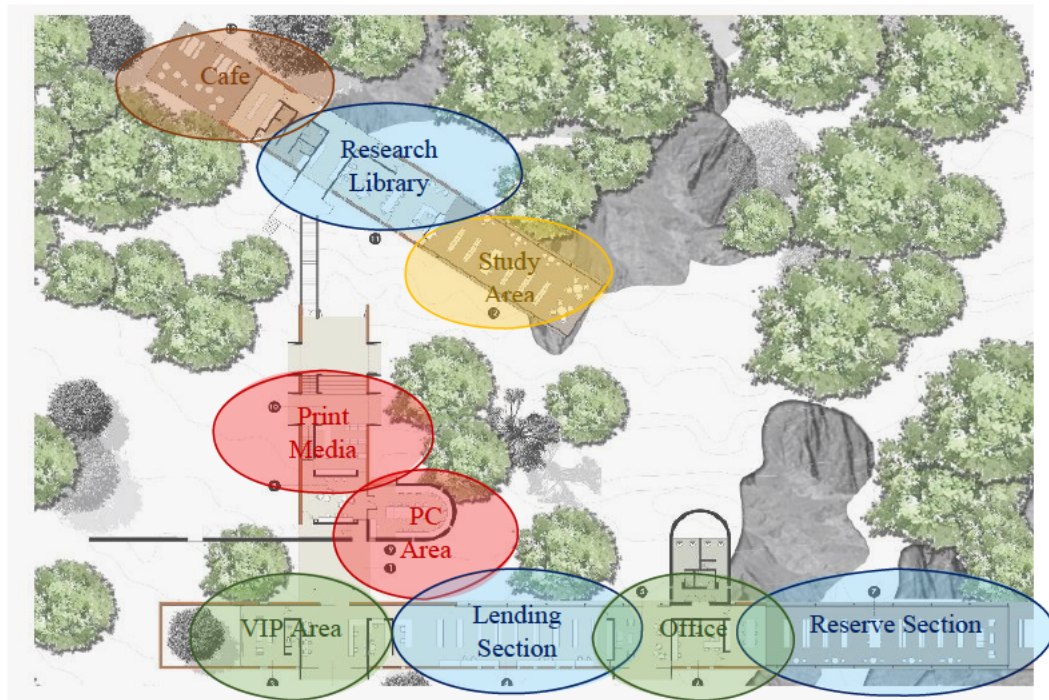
ii: The Community Library floorplan. (Source: www.lafargeholcim-foundation.org; Author)
